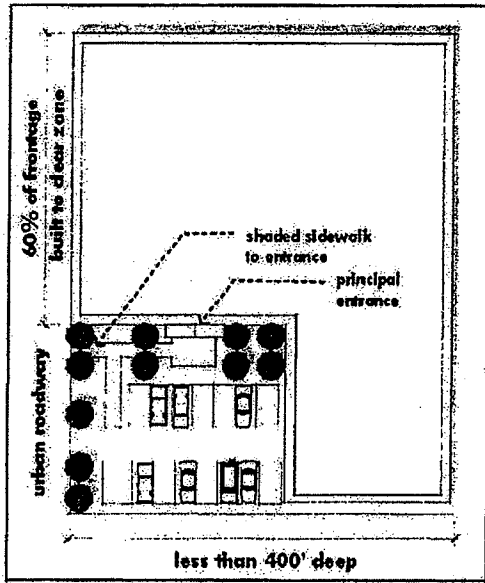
Parking is permitted between the building and the roadway on shallow lots less than 400 feet deep, when certain conditions are met.
